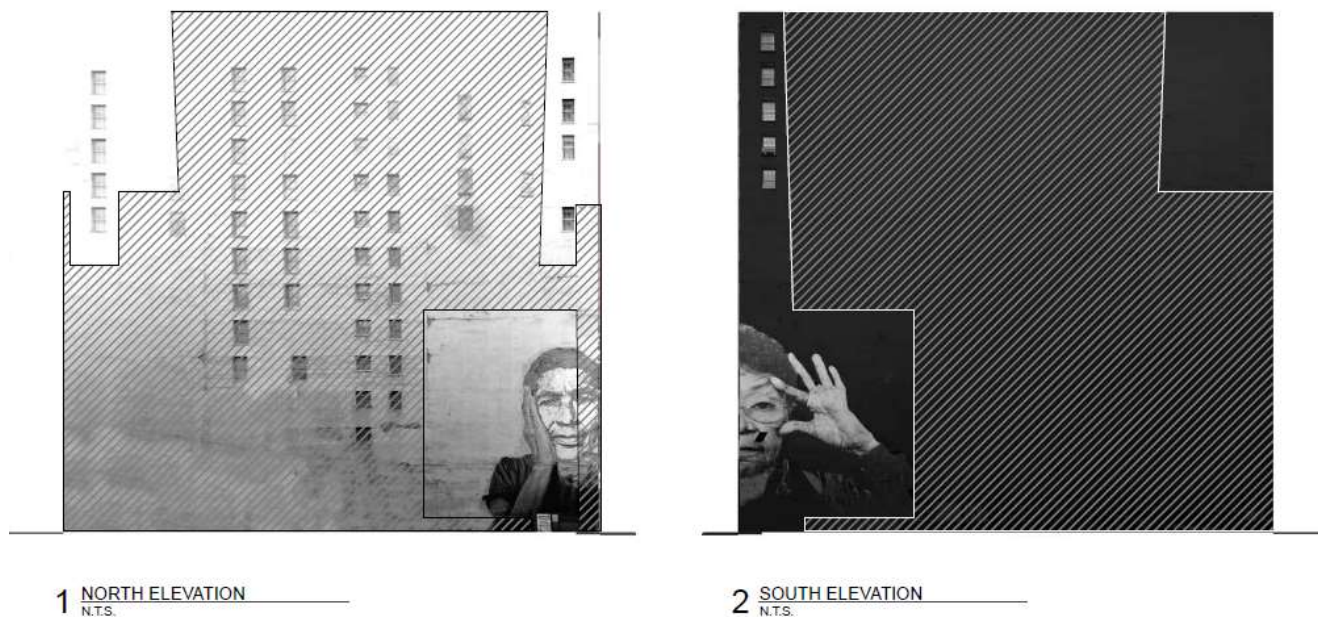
Adjacent Building Coverage (Adam Sokol Architecture Practice/HLW, Inc., April 2016)
